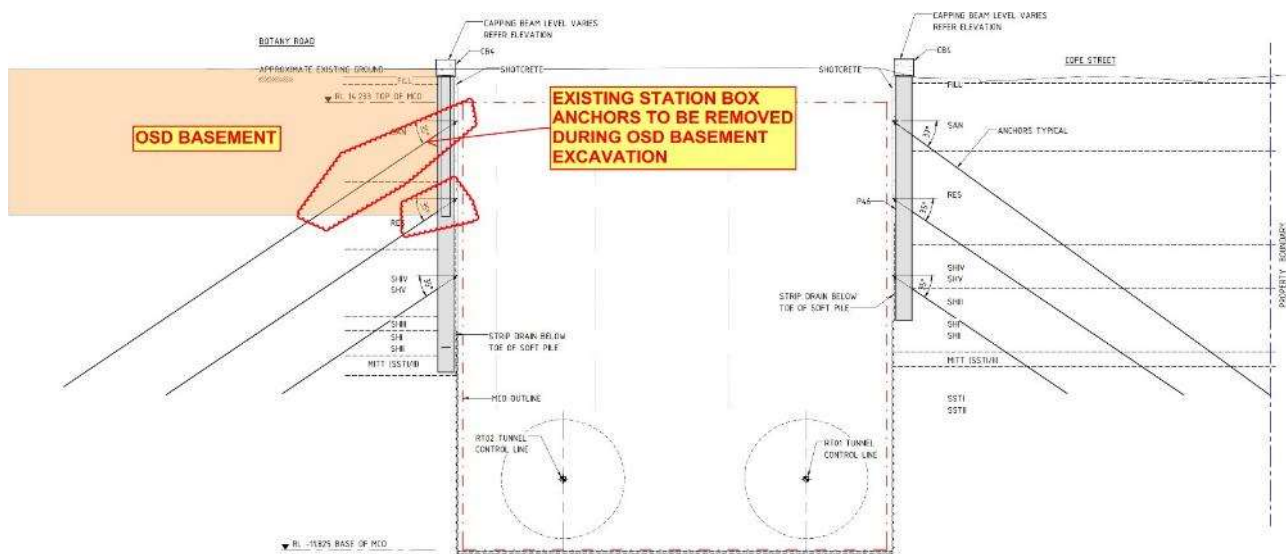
Typical Section through OSD Basement / Station Shoring Wall – Anchors in OSD Basement
